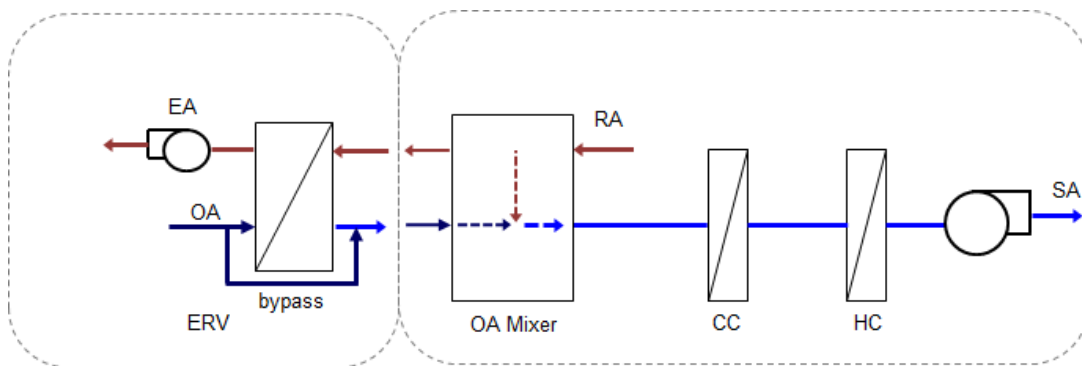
Schematics HVAC system with ERV and outdoor air mixer
